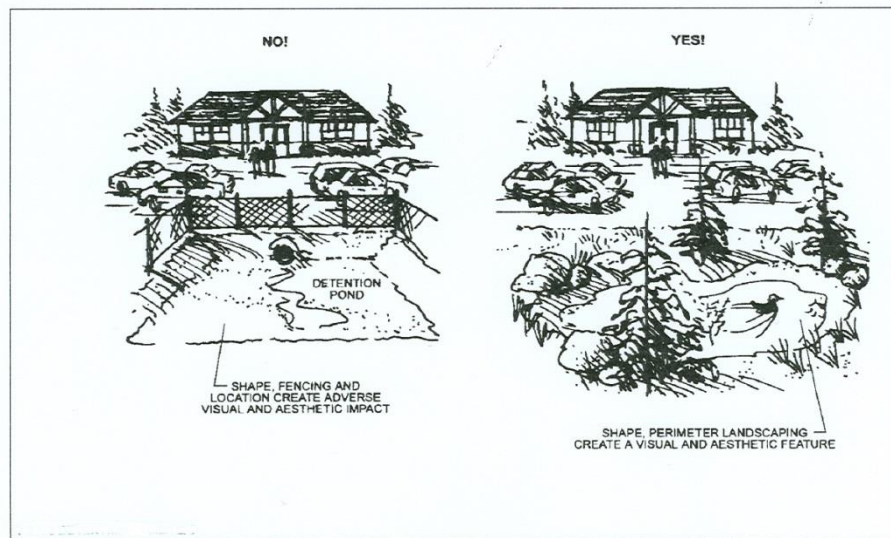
DETENTION AND STORMWATER FACILITIES
